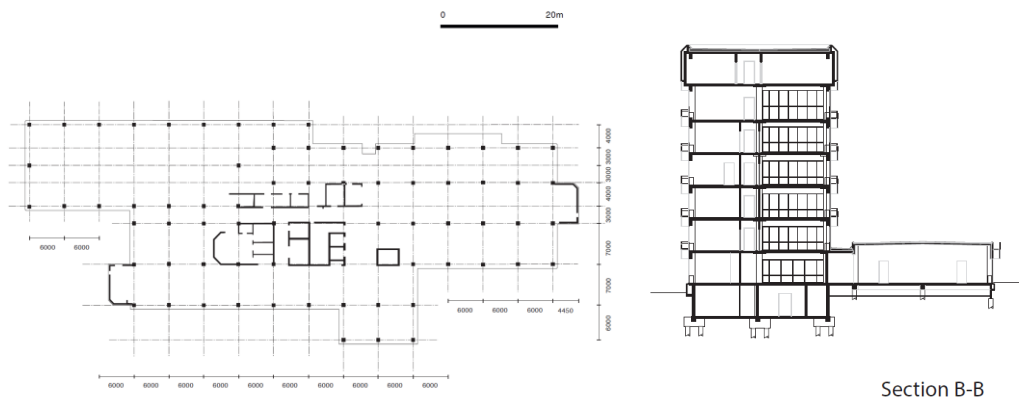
& 10. Eindhoven Building Object: Structural Floorplan and Cross Section.
